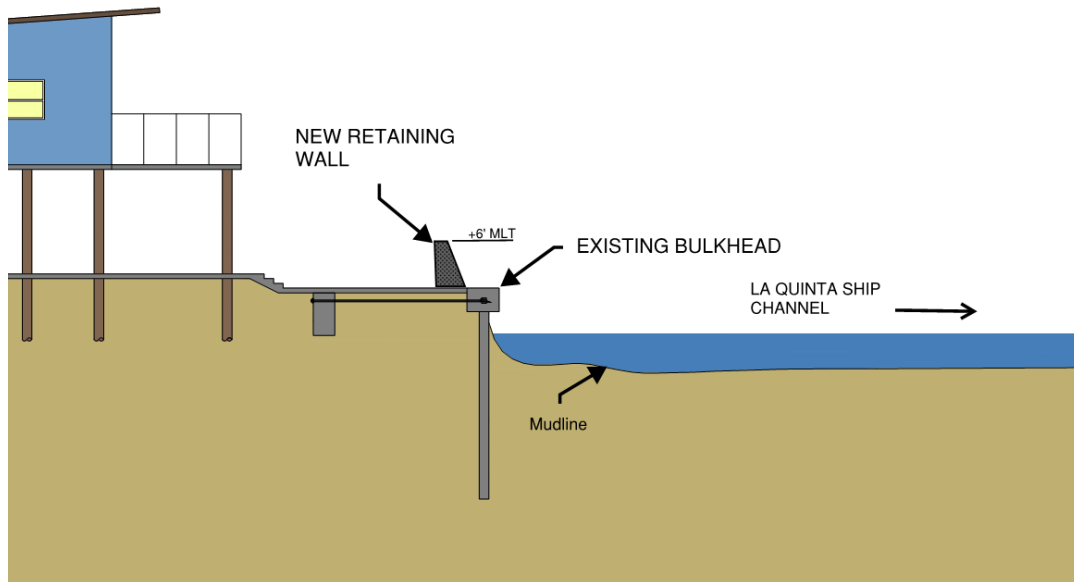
Alternative 3B - Increase Bulkhead Elevation at all sites
